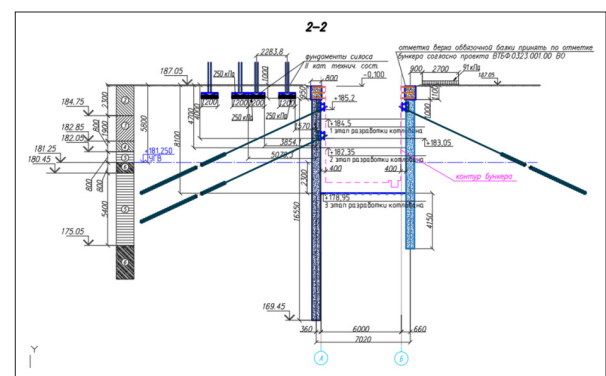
Scheme of vertical binding of buried retaining structures of the construction pit
